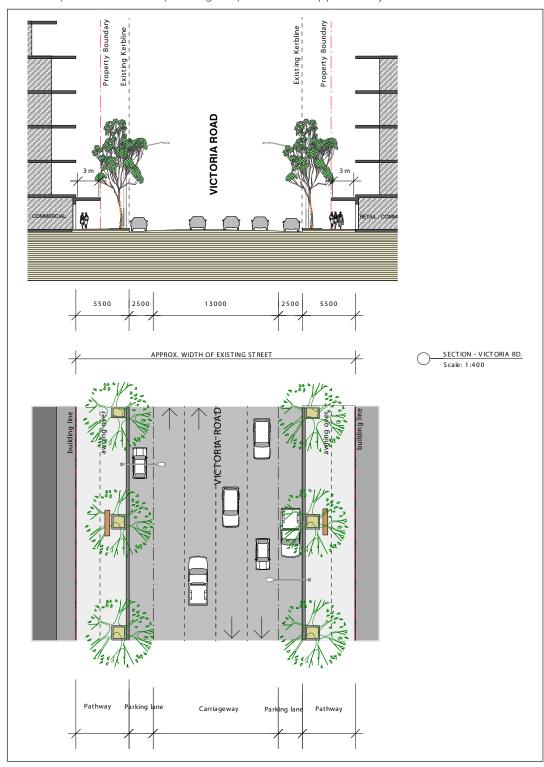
Victoria Road Section - North and South Gladesville Precincts
